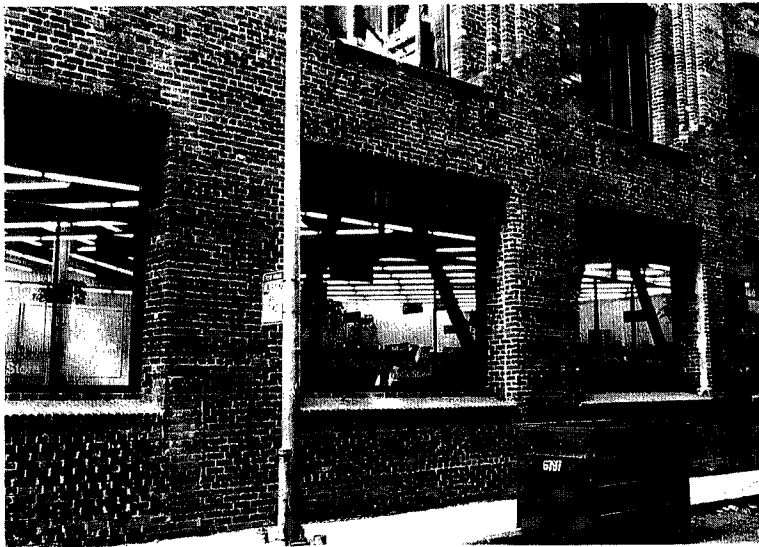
Retrofitted unreinforced masonry building in South-of-Market District of San Francisco (Golden Gate University Book Store).
